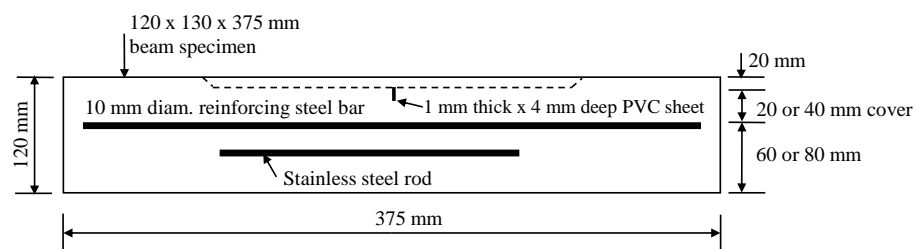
Schematic of a beam specimen with 1.0 mm thick PVC sheet
